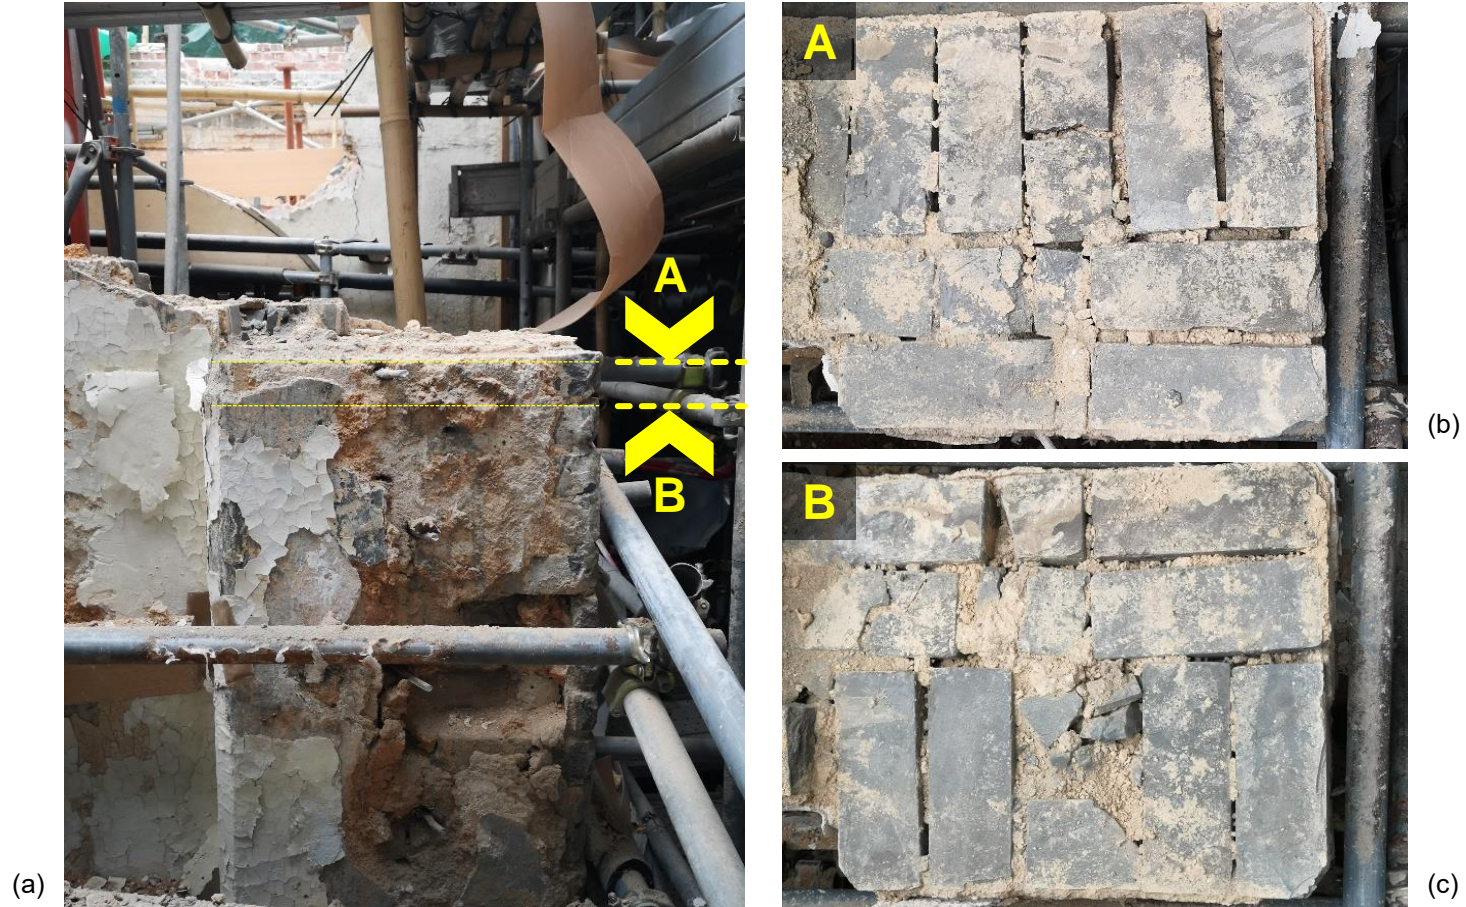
Visual inspection during removal works, revealing copious evidence of substantial and widespread voids in brick vertical and horizontal joints
